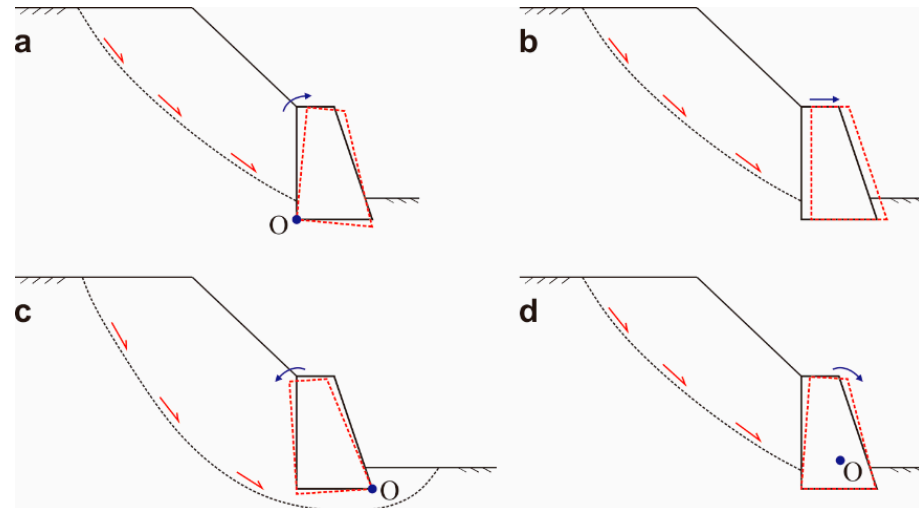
Deformation failure modes of gravity retaining walls (O is the center of rotation; (a) overturning; (b) toppling; (c) deep sliding; (d) eccentric failure).
